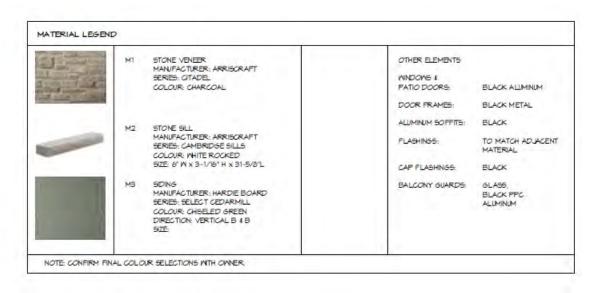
Proposed materials for five storey mixed-use Building A (Source: Fryett Turner Architects, 2023).
